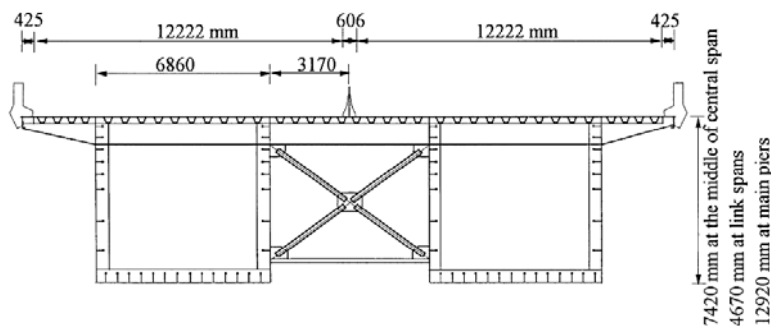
Steel twin-box-girder of Rio Niterói Bridge
